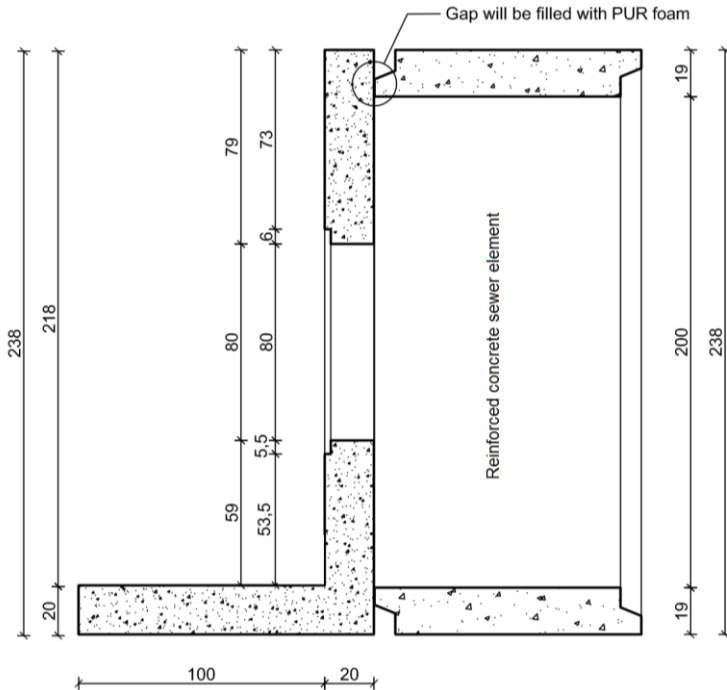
Prefabricated L-shaped concrete wall (dimensions in cm).
